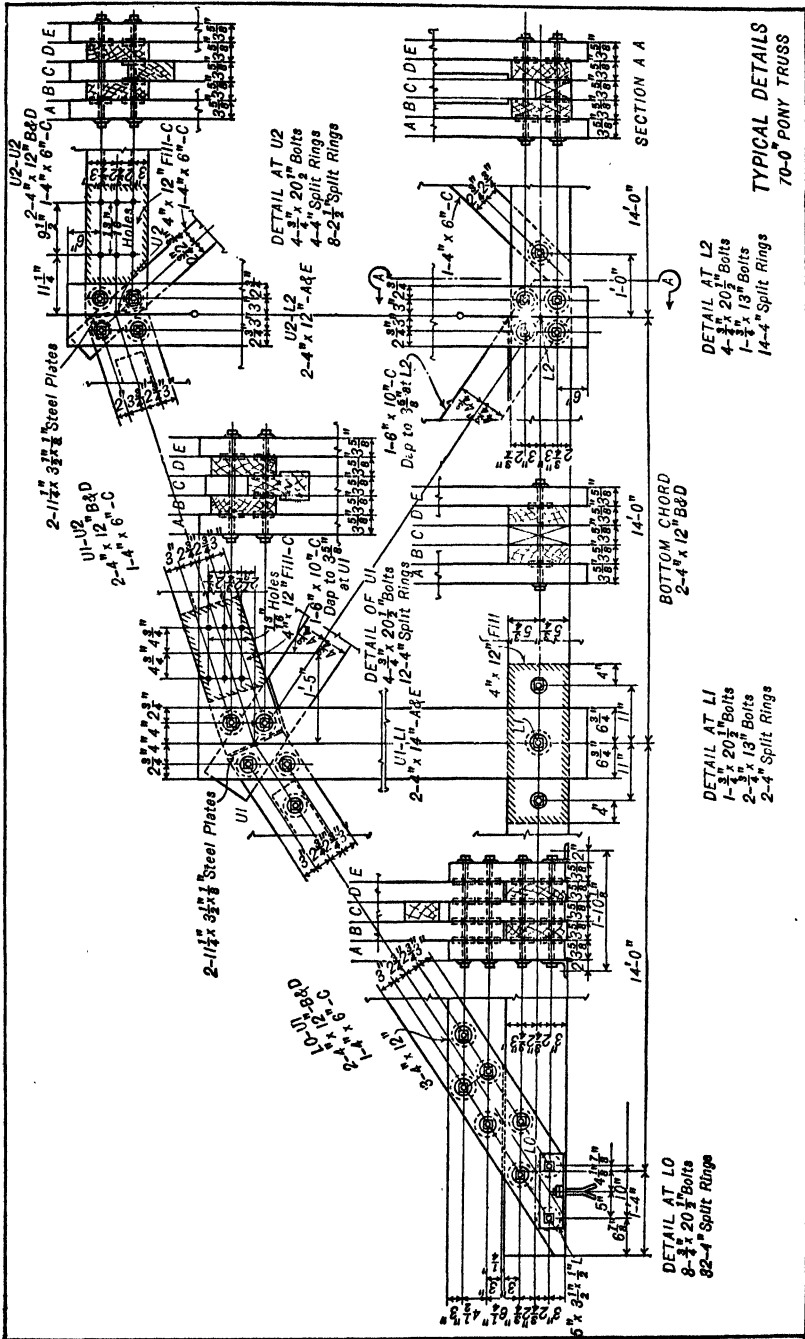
Typical Details of a Bridge Truss with Timber Connectors.
